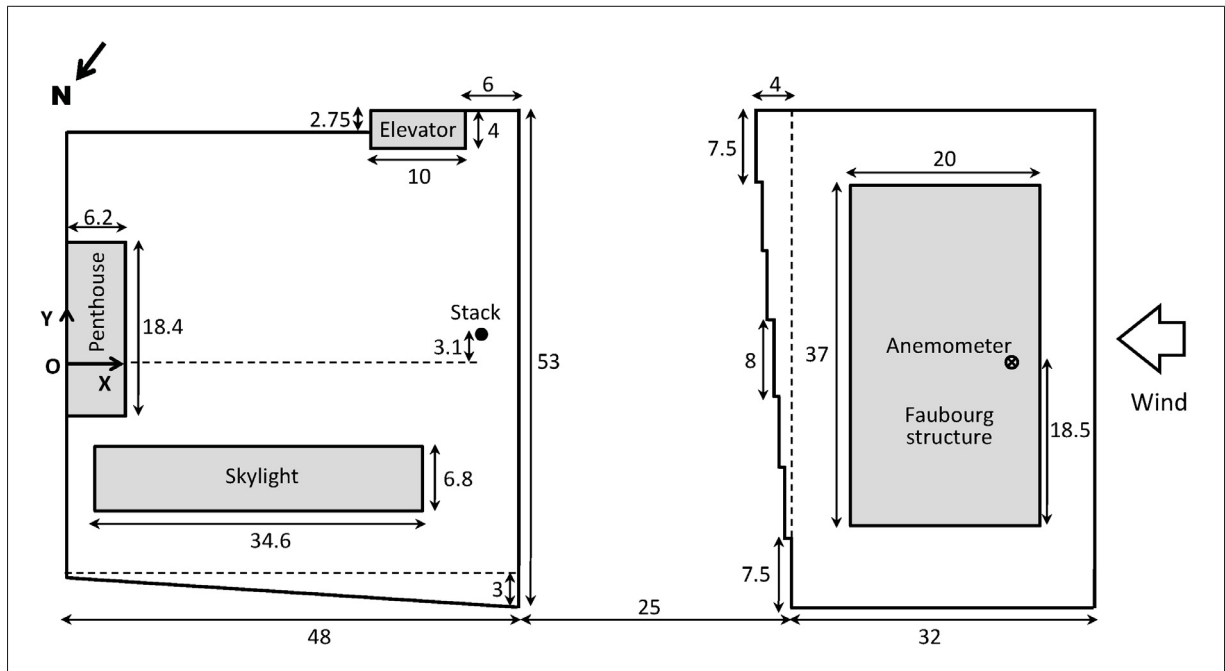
Plan view of the BE building and Faubourg tower. All dimensions in [m].
